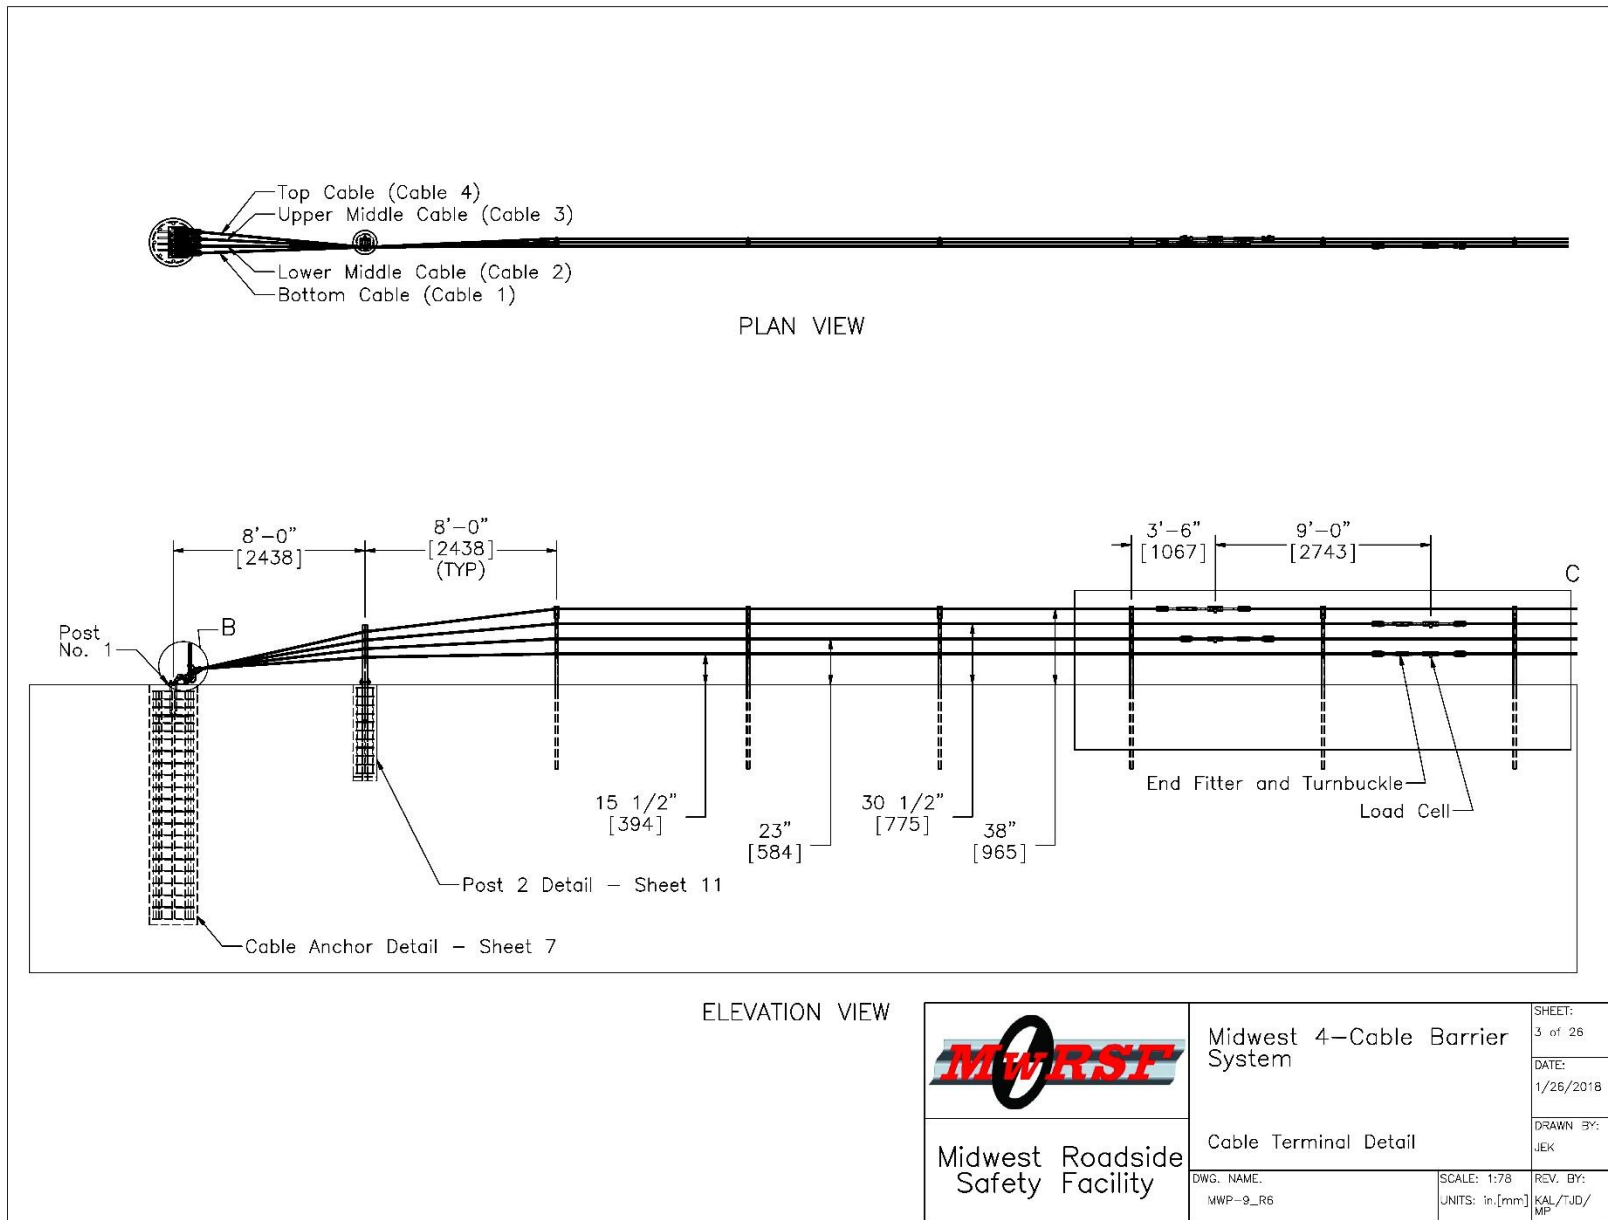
Cable End Terminal Detail, Test No. MWP-9
